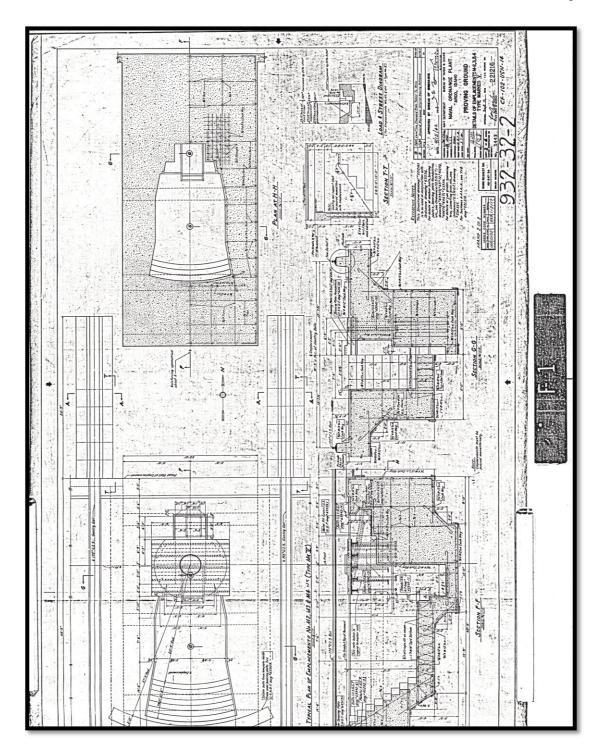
INL drawing number 112117 (CF-102-USN-14); proof / gun emplacement area, details of emplacements M-2, -3, and -4, typed marked V, frame 1 of 2; September 1942.
